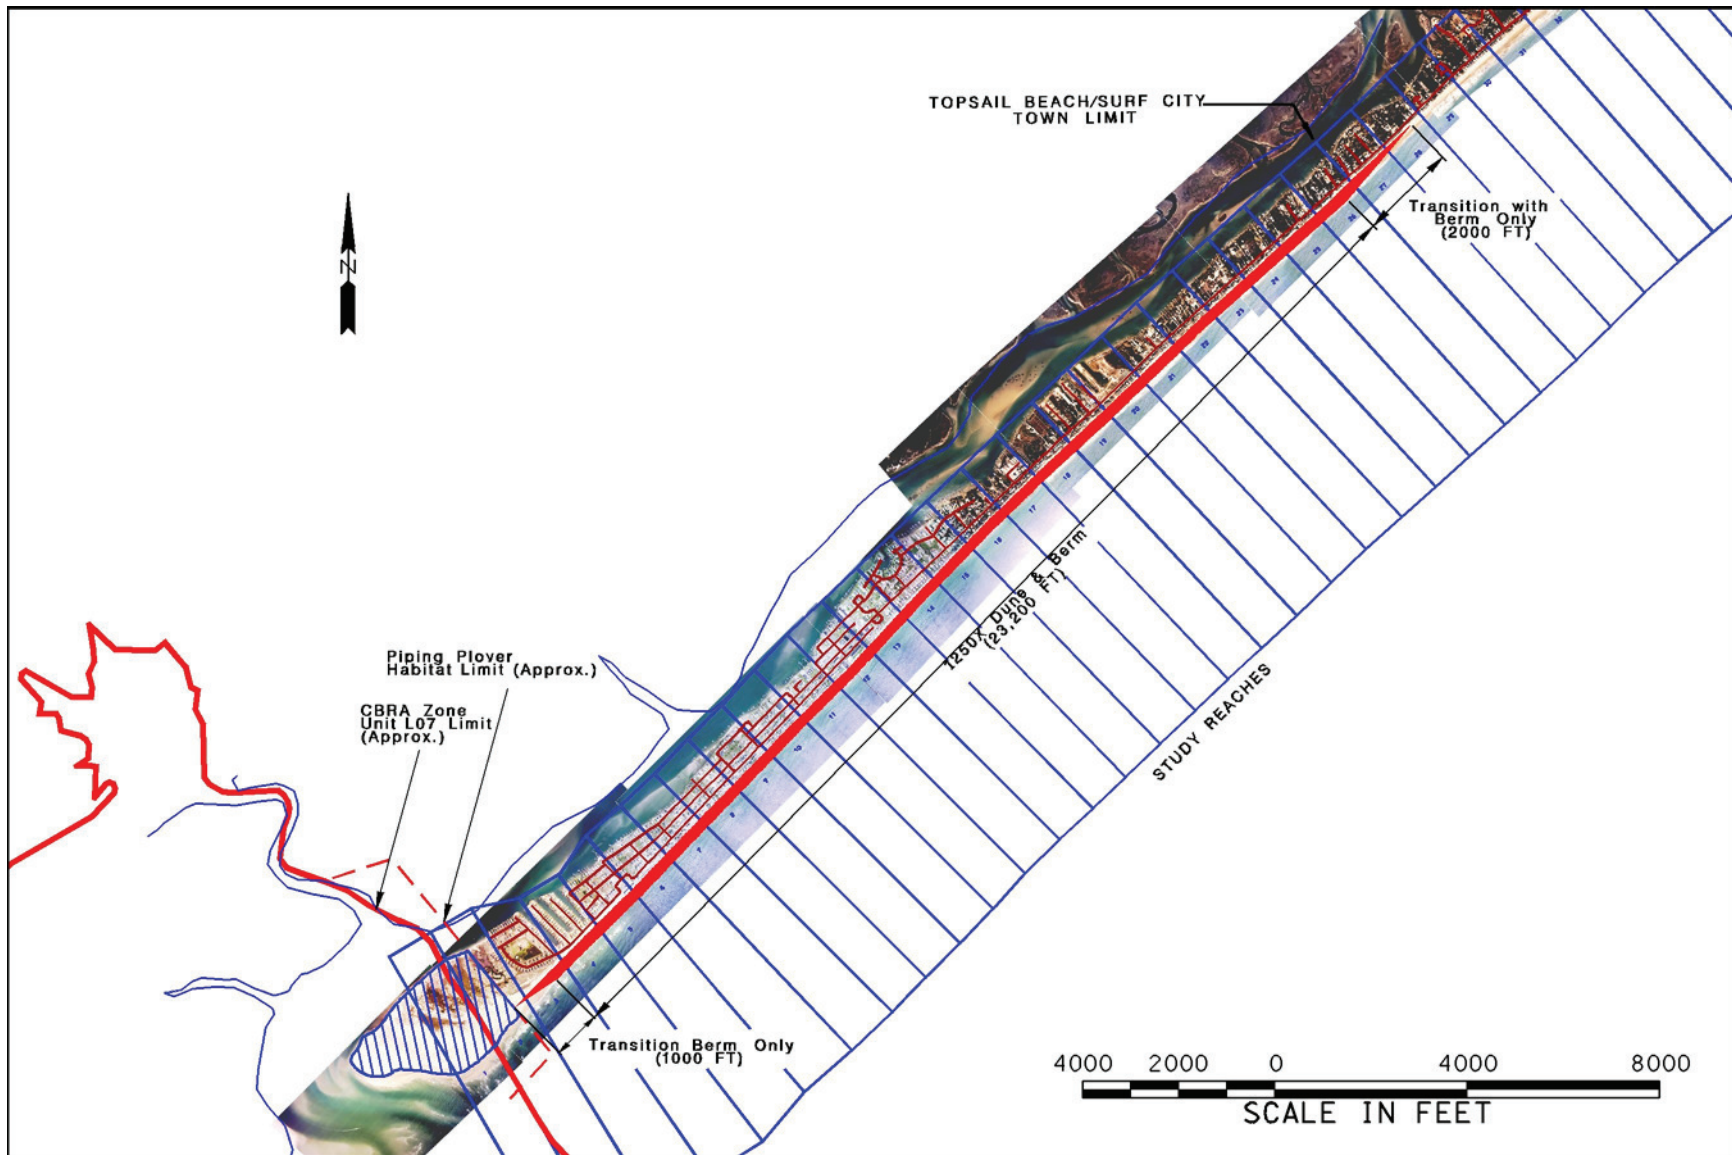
Plan 1250X, Locally Preferred Plan, Plan View
